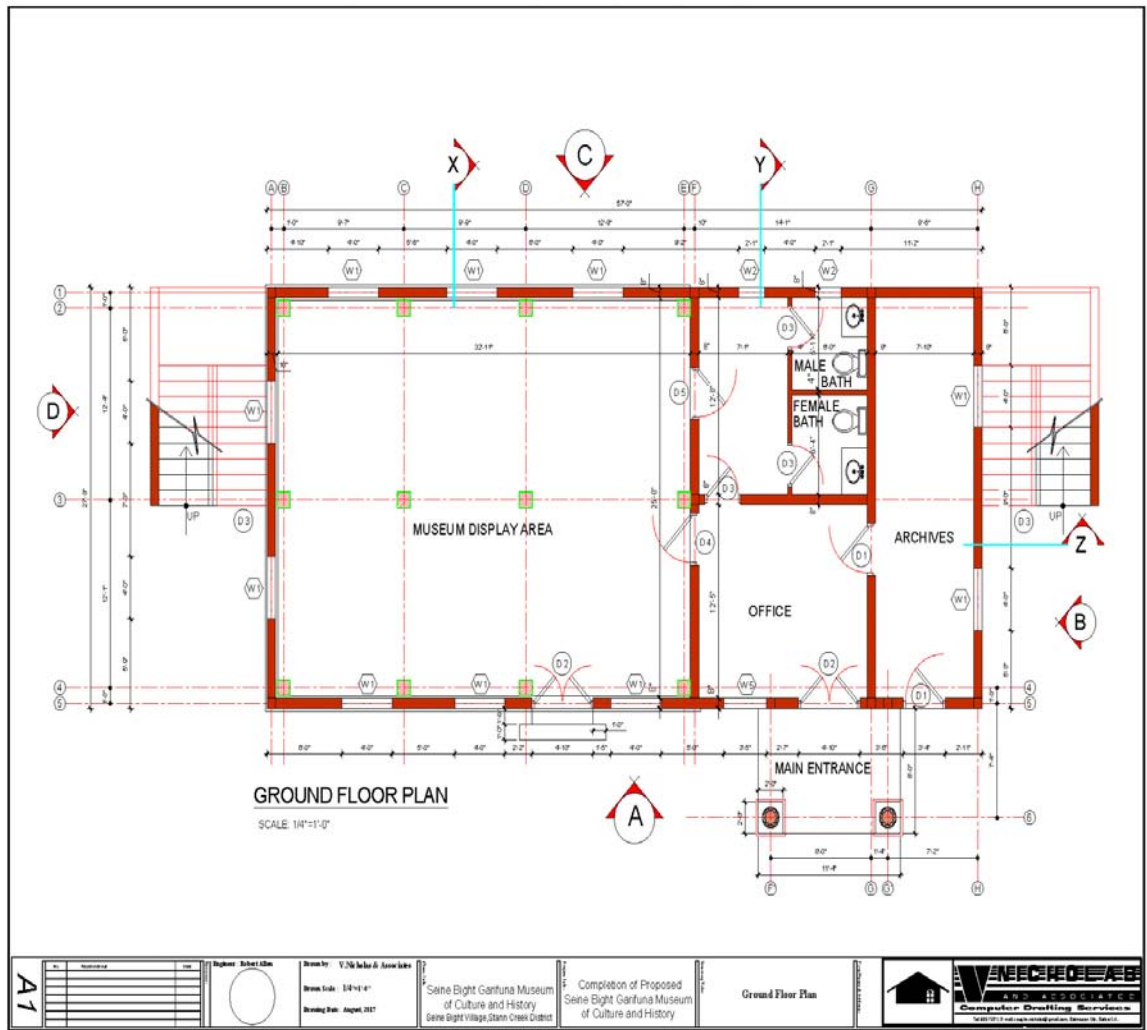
Museum Ground Floor Plan (source: Architect VNicholas and Associates)
